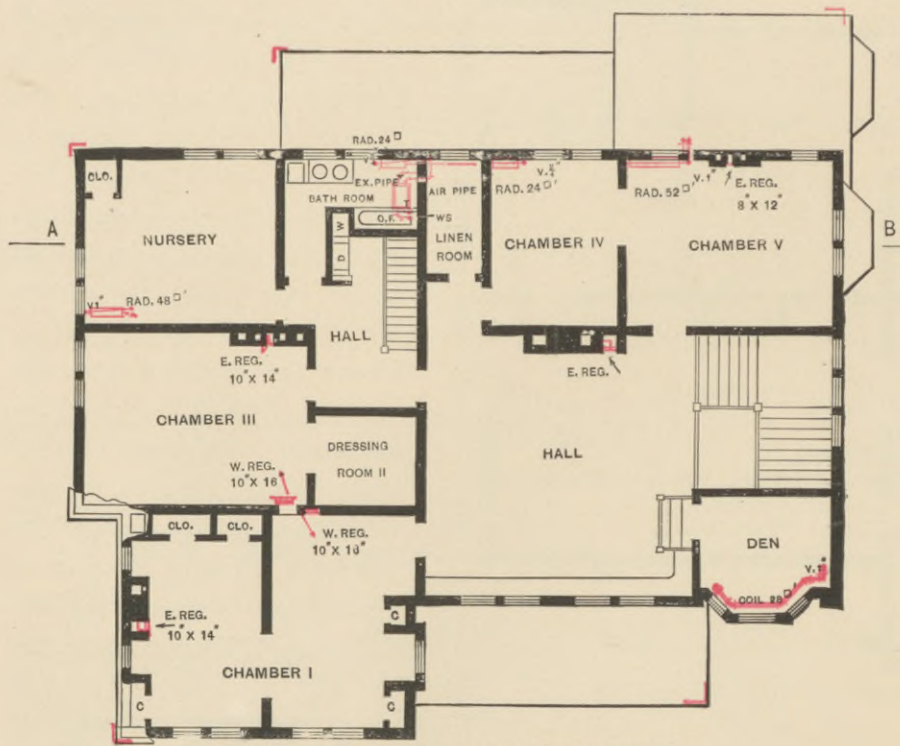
Plan of Chamber Floor. Scale  $\frac{1}{8}$  inch to the foot.
